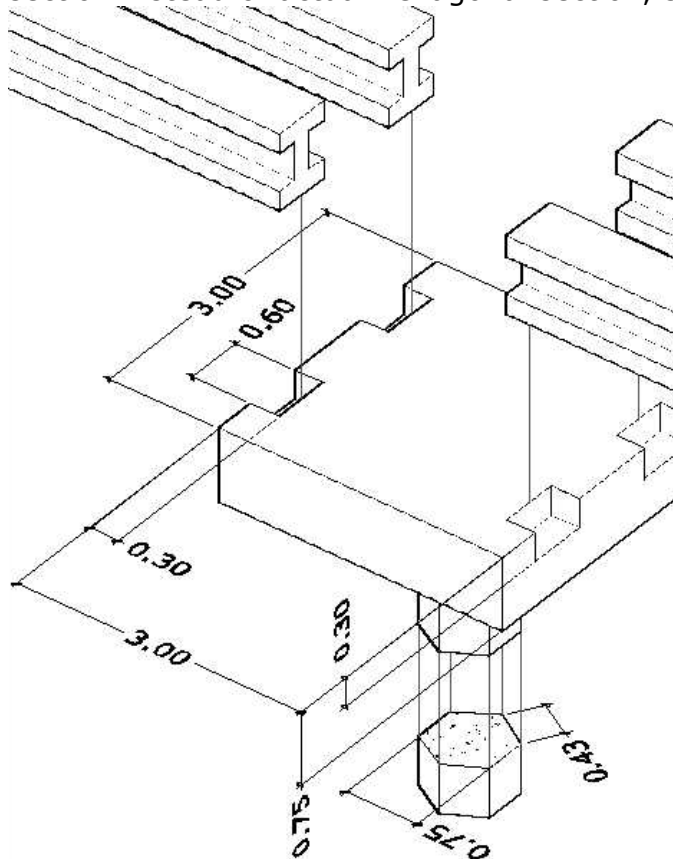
Final design section for Problem 9.7-4.
